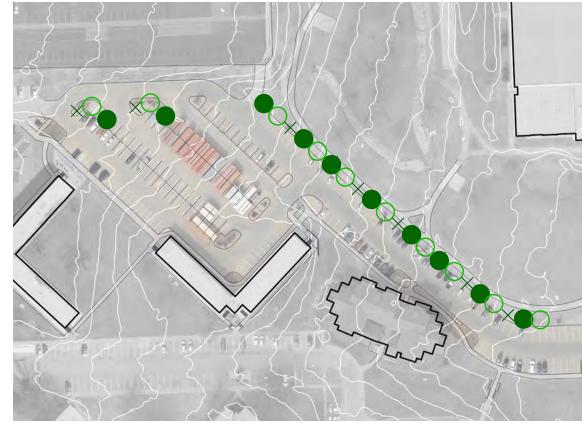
Proposed tree plantings for the North Jardine parking lot.
